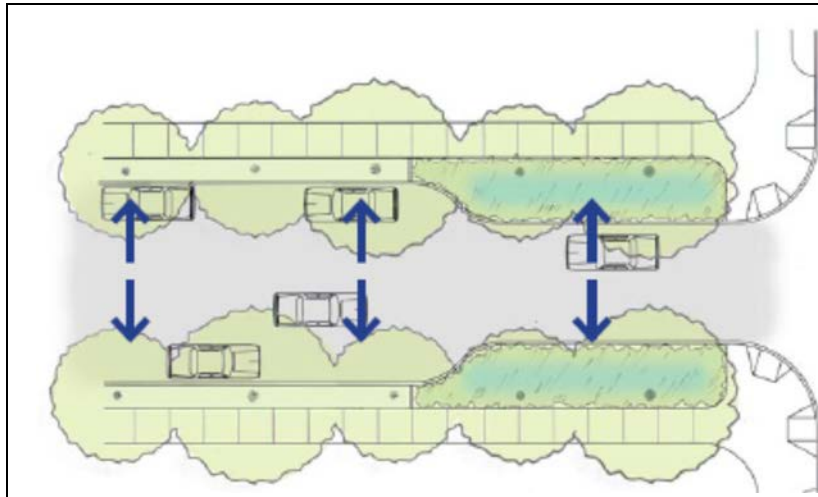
Crowned Street Profile. A crowned street is designed so that the highest elevation is in the middle of the street, such that stormwater runoff drains to the sides of the street. GI facilities may be located on either side of the street.
